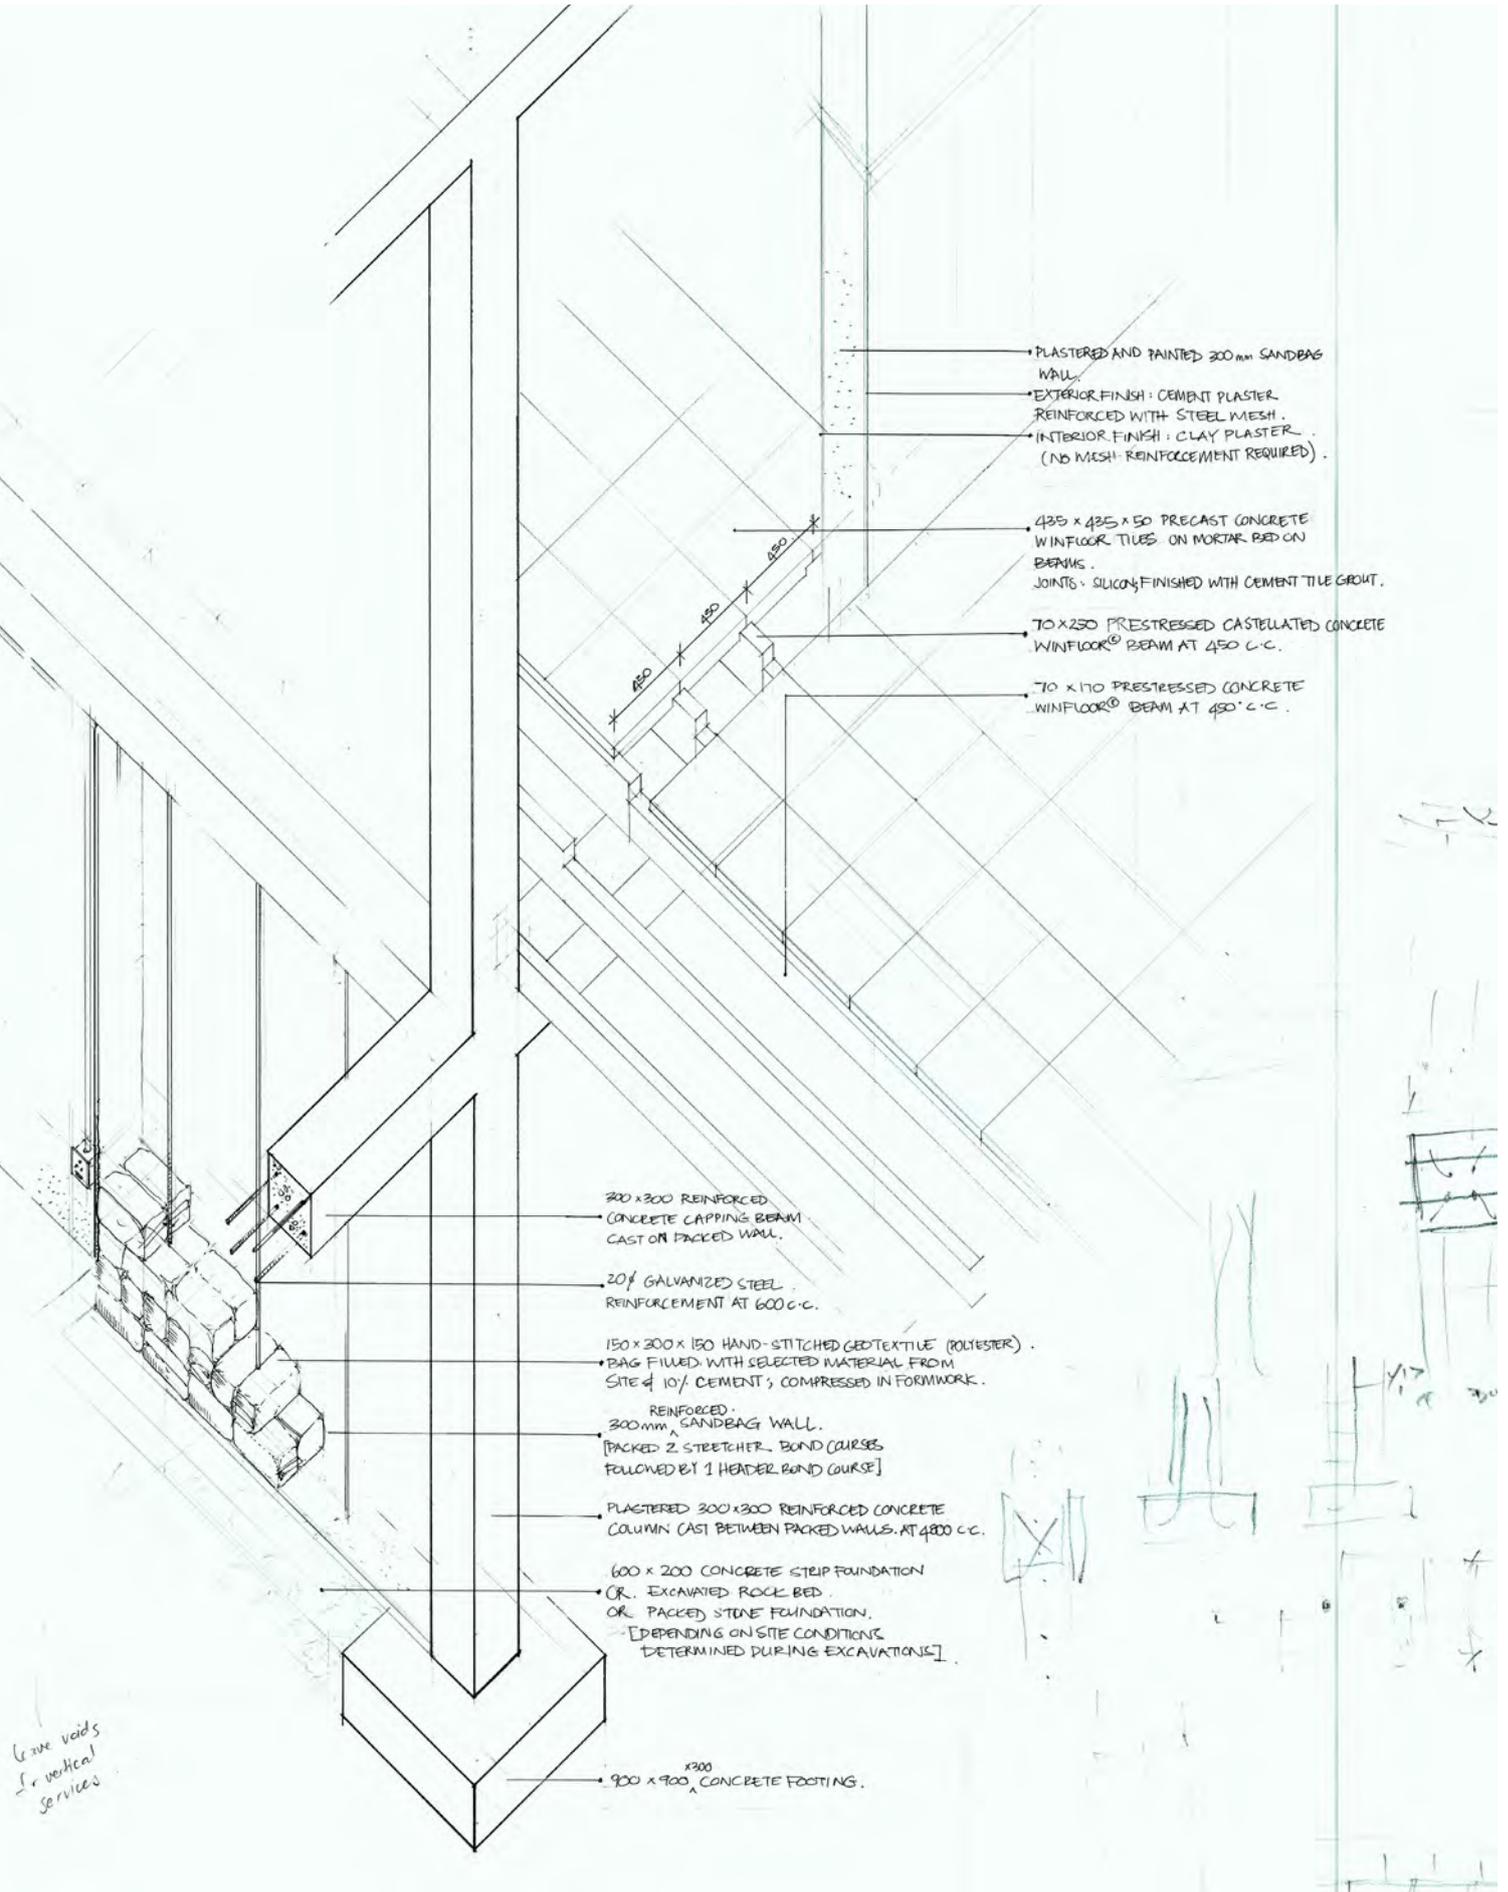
Axonometric of typical construction in the consultation and office building, not to scale (Author 2017)
